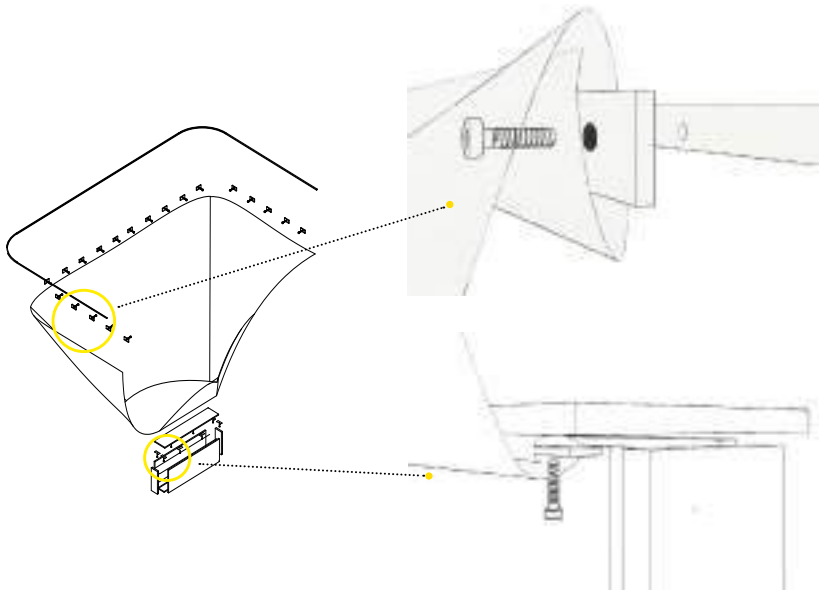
Constructive detail - Joints for attachment of the outfitting curtains | Axonometric views.
